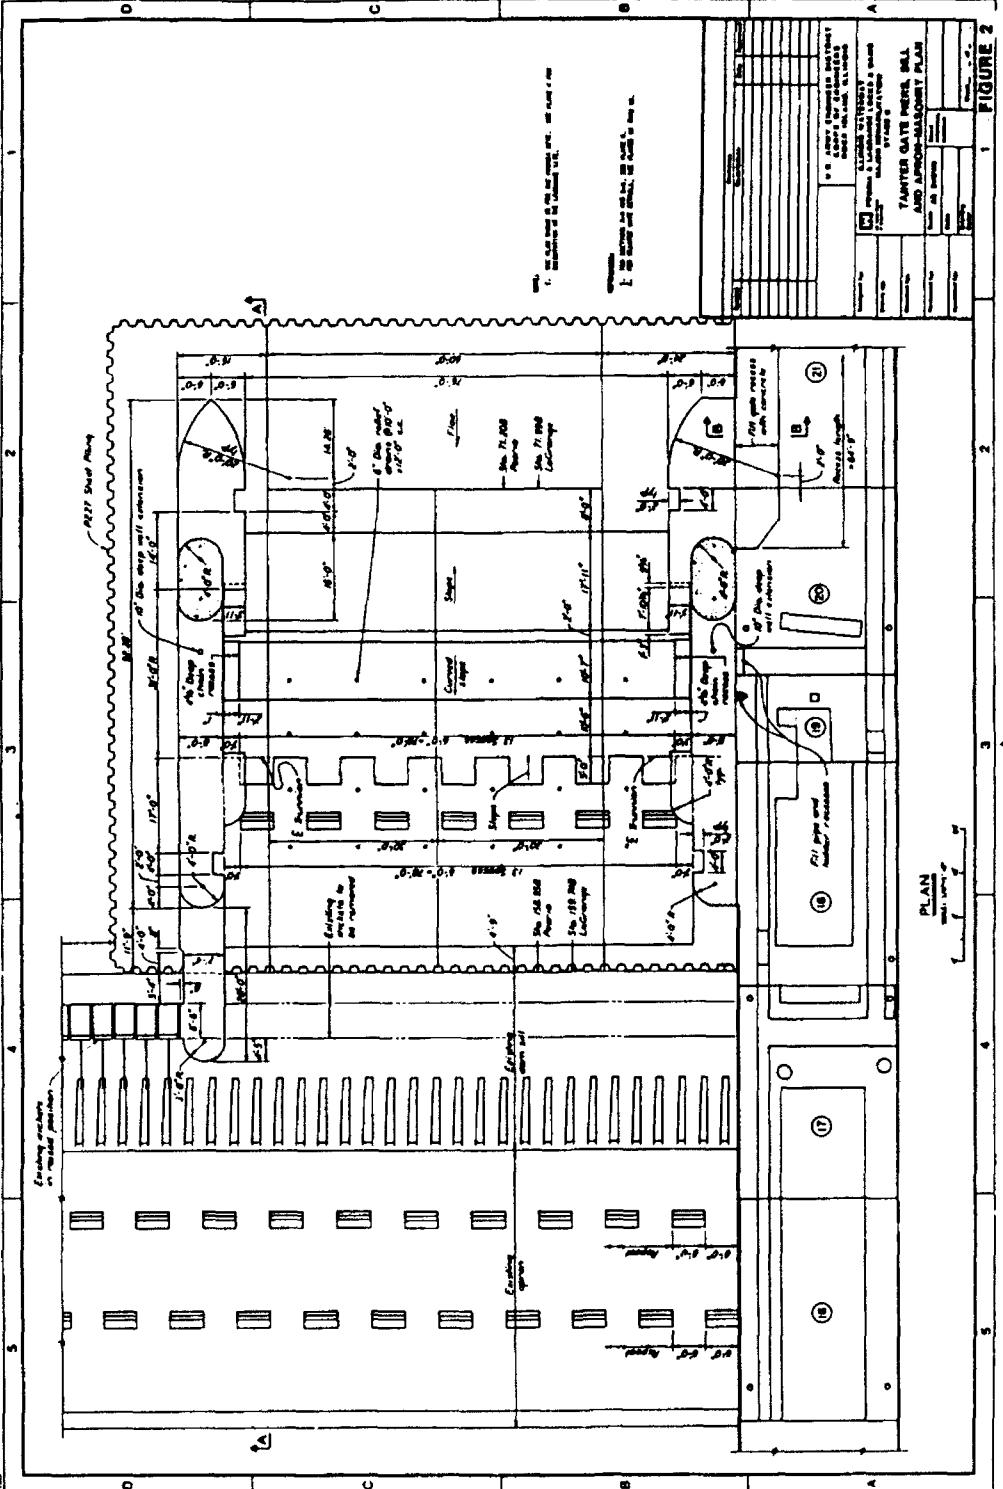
Peoria Lock and Dam—tainter gate piers, sill, and apron-masonry plan
